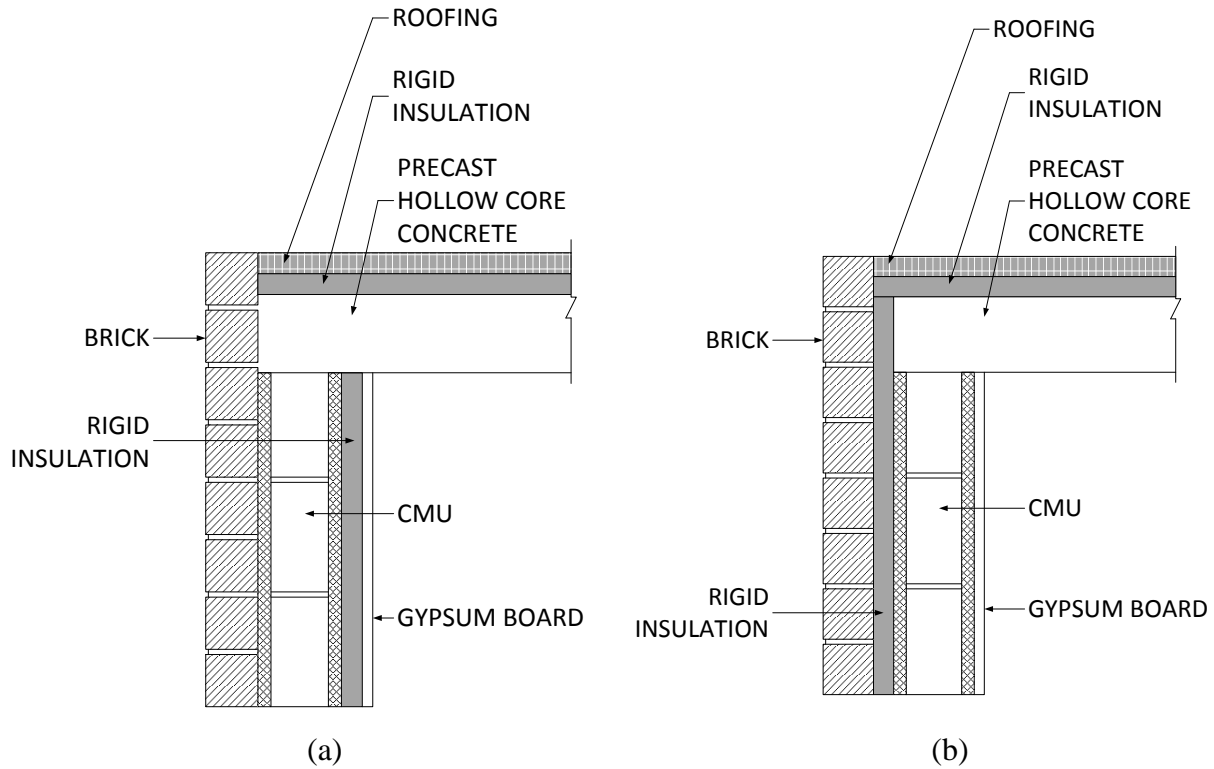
(a) Insulation in the inner surface of the wall and (b) Insulation in the center plane of the wall
